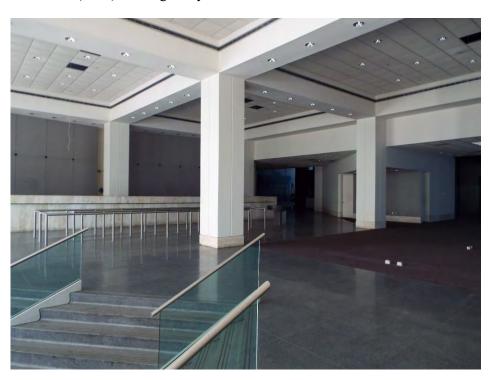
Original railing detail located at level 2 and 3 main lobby and level 5 balcony
